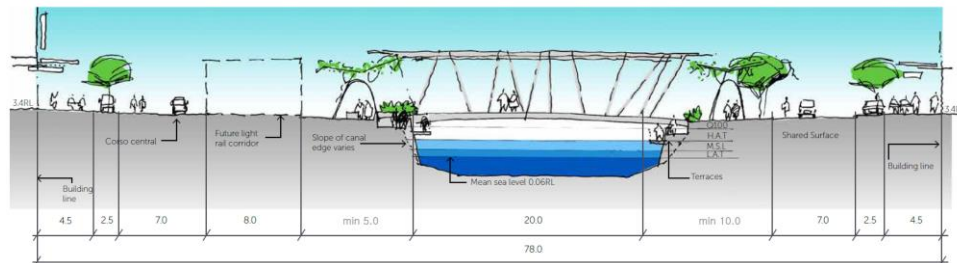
Corso Esplanade (between Main Street Boulevard and Town Centre Boulevard) (Looking East)
